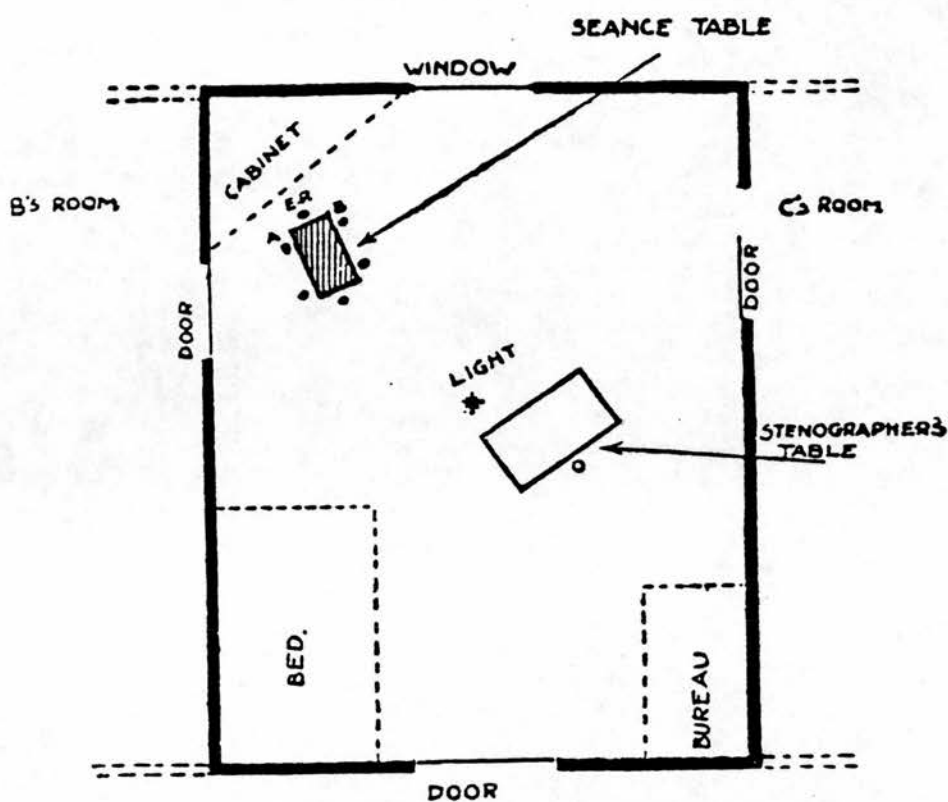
The floor plan, as presented in Carrington (1909a).
